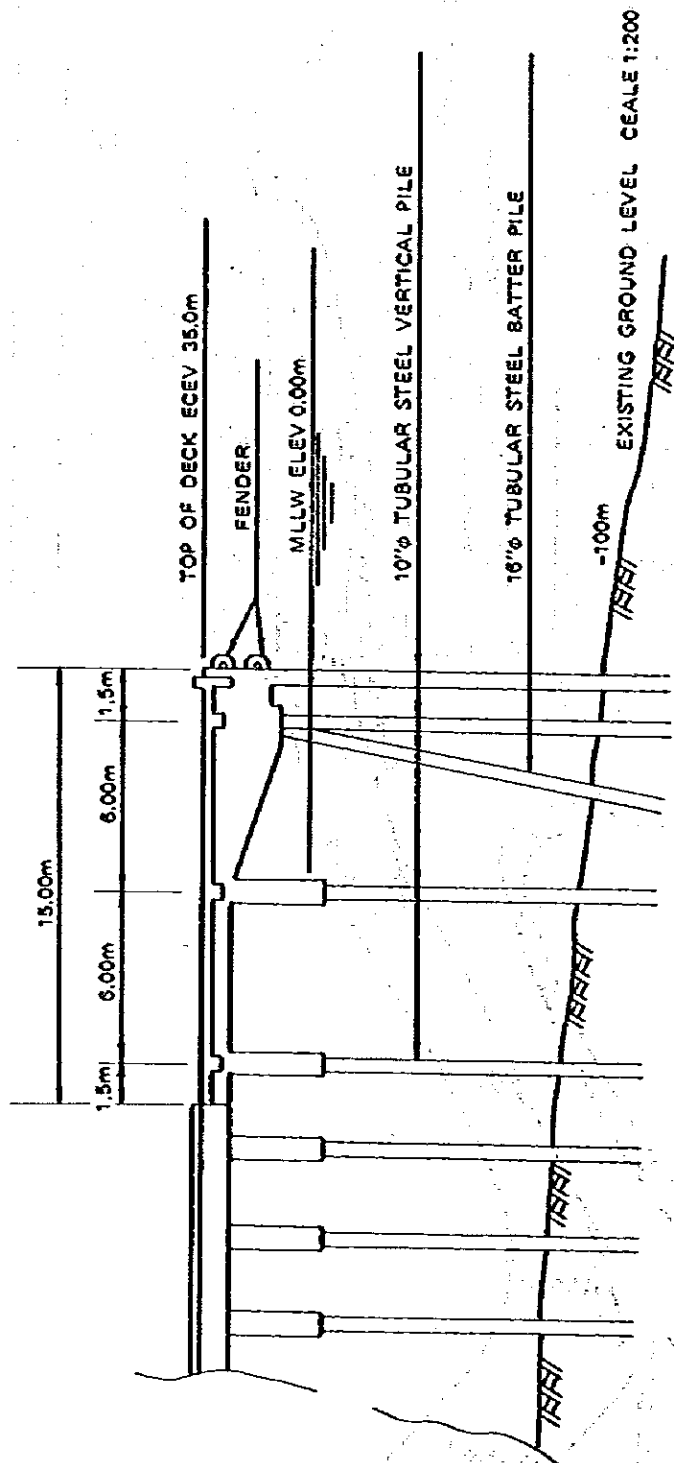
Typical Cross Section of Pier at Port of Irene
